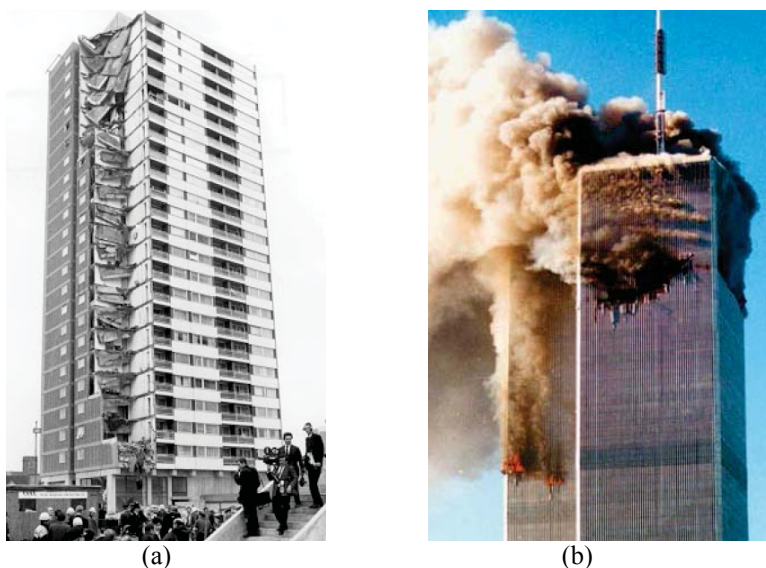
Structural progressive collapses: the cases of the Ronan Point building in London (1968) (a), and of the World Trade Center towers in New York (2011) (b).
